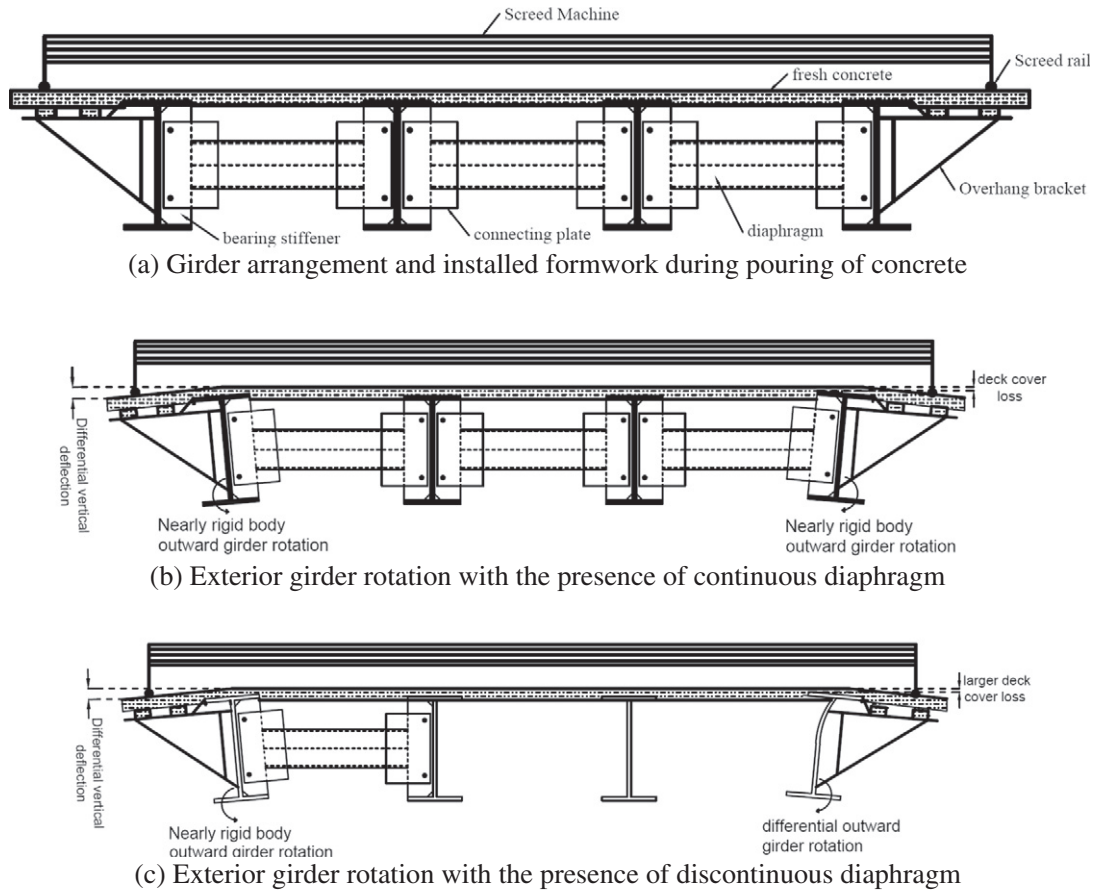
Exterior girder rotation due to unbalanced eccentric load on overhang deck with inconsistent diaphragm; (a) girder arrangement and installed formwork during pouring of concrete, (b) exterior girder rotation with the presence of continuous diaphragm, (c) exterior girder rotation with the presence of discontinuous diaphragm.
